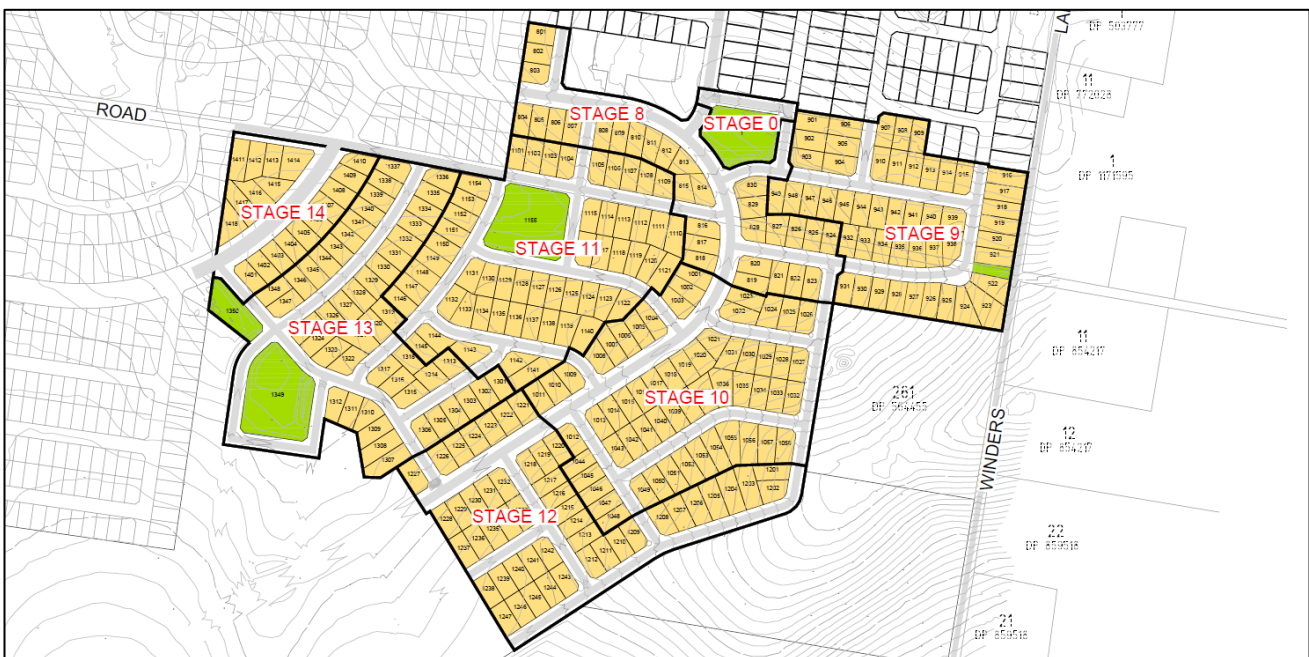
Extract from Overall Masterplan - Stages 8 to 14 (Source: BRS; 18.10.2021)
